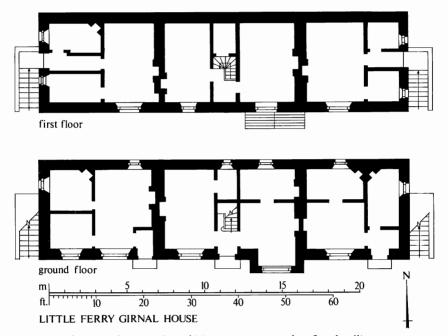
Plans, Little Ferry Girnal House as converted to five dwellings, 1859.
